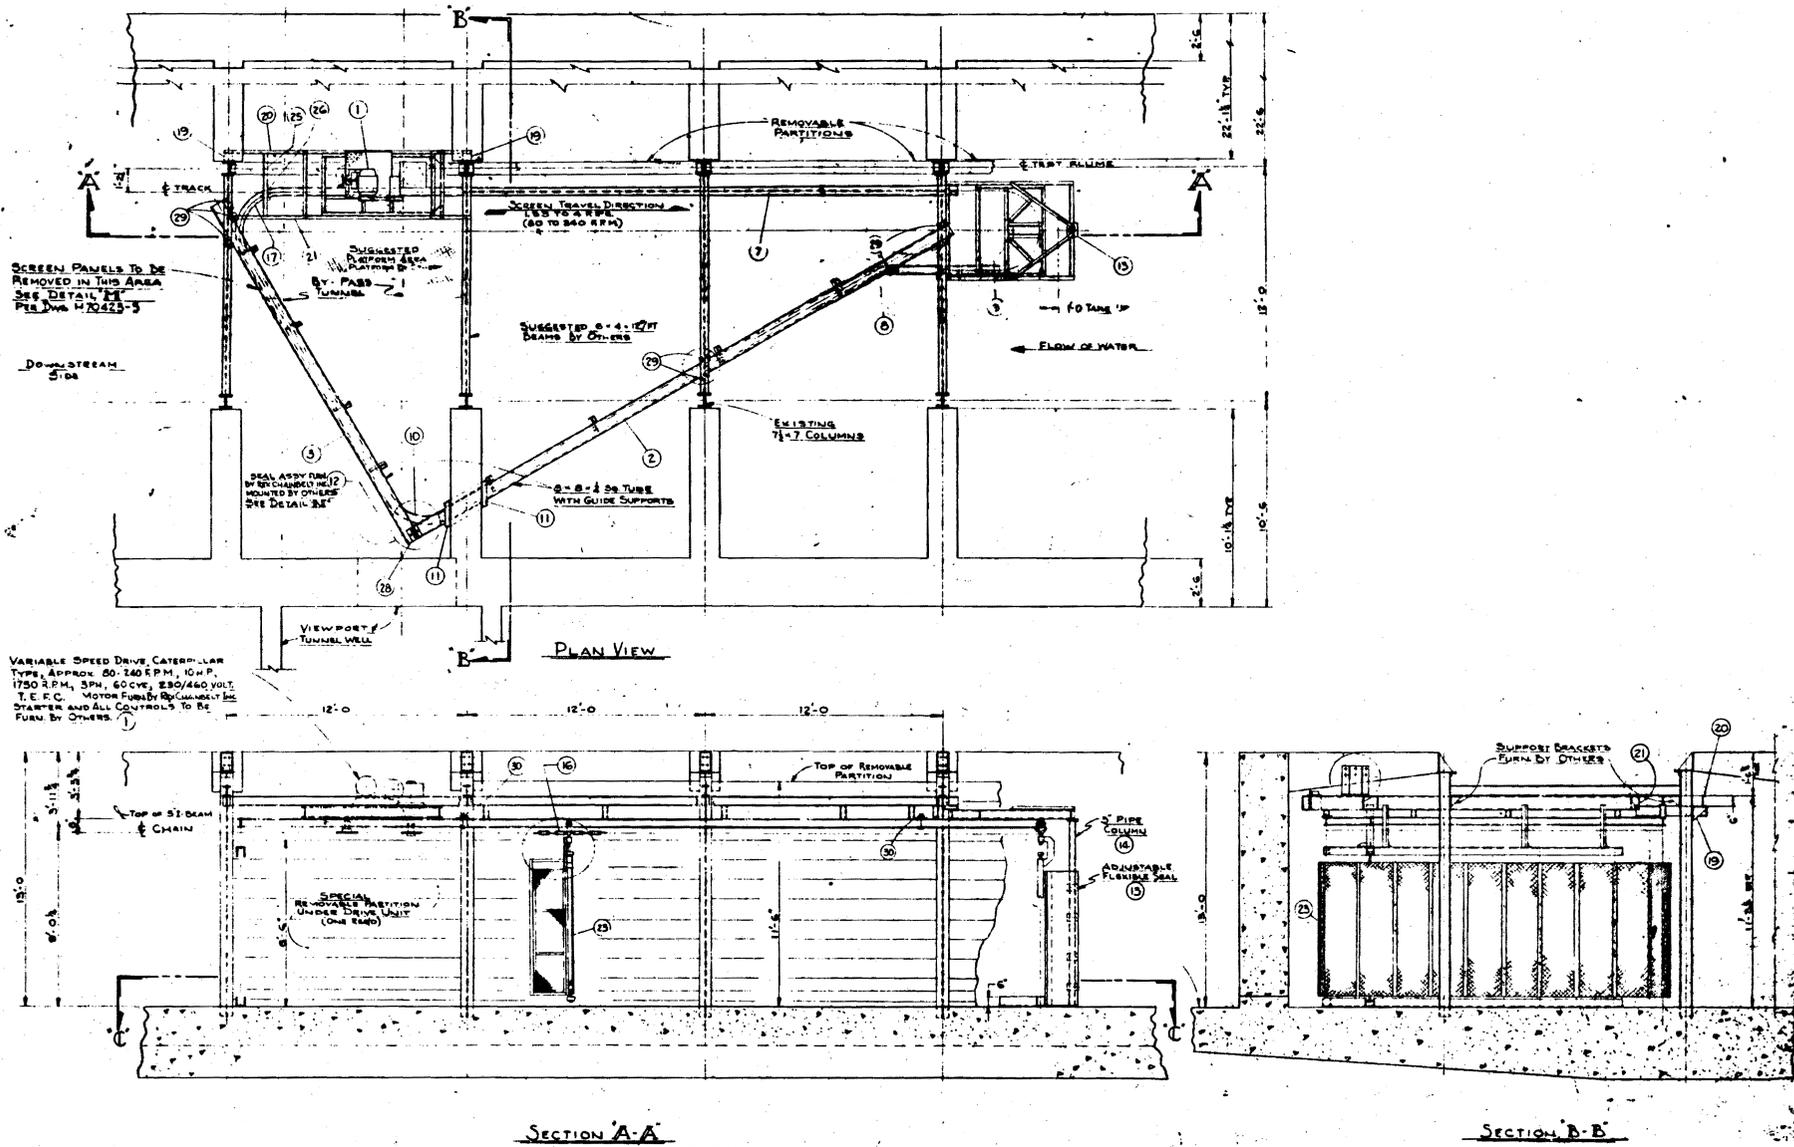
Plan and elevations of traveling screen installed near Troy, Oregon.
